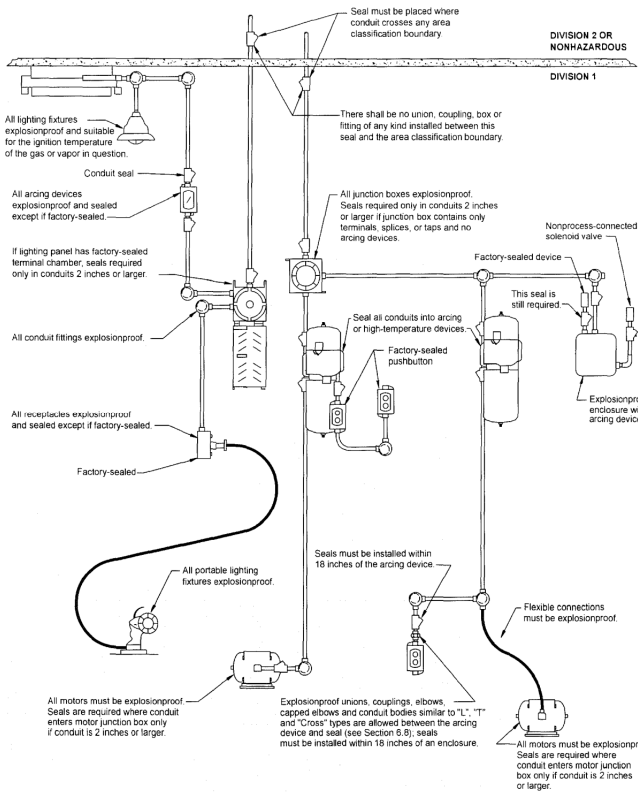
Typical Class 1, Division 1 Electrical Installation Conduit System
